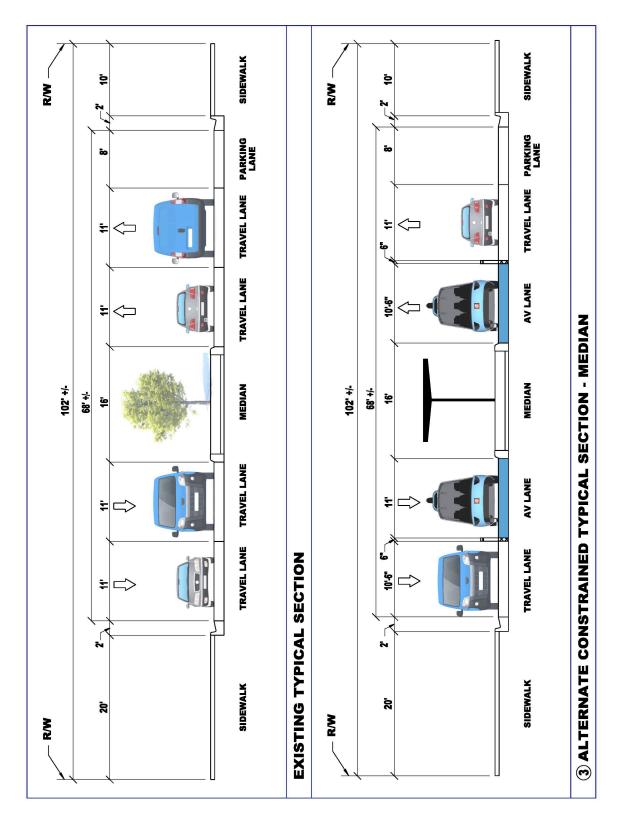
North Corridor Existing and Alternate Constrained Typical Section with Median Station - Main Street
